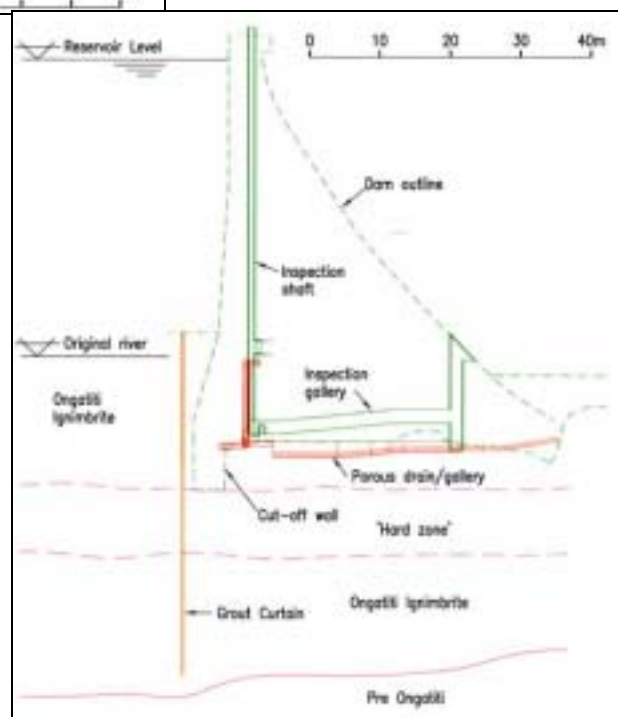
Cross-section of Arapuni Dam. (Note the spatial separation of the grout curtain from the dam or its concrete cut-off.)
